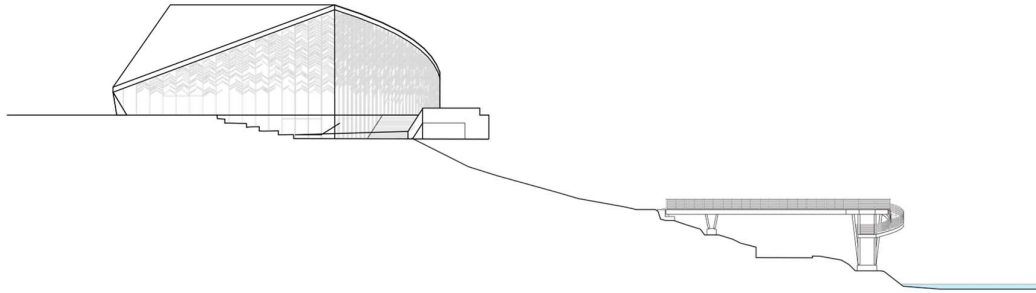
Side view of the bridge in relation to Lakehouse and Landvettersjön.
